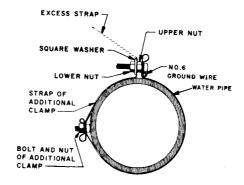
Attaching L Ground Clamp to Pipes Larger Than 3 Inches
